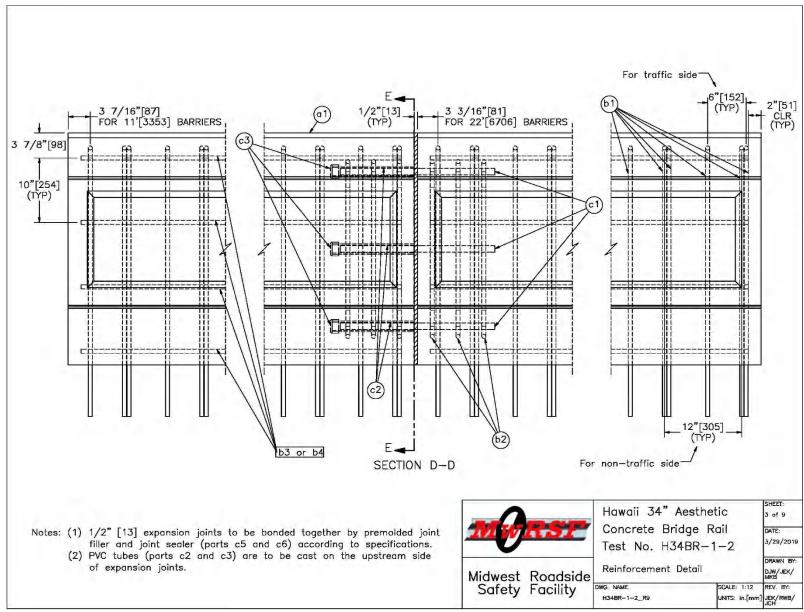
Reinforcement Detail, Test Nos. H34BR-1 and H34BR-2
